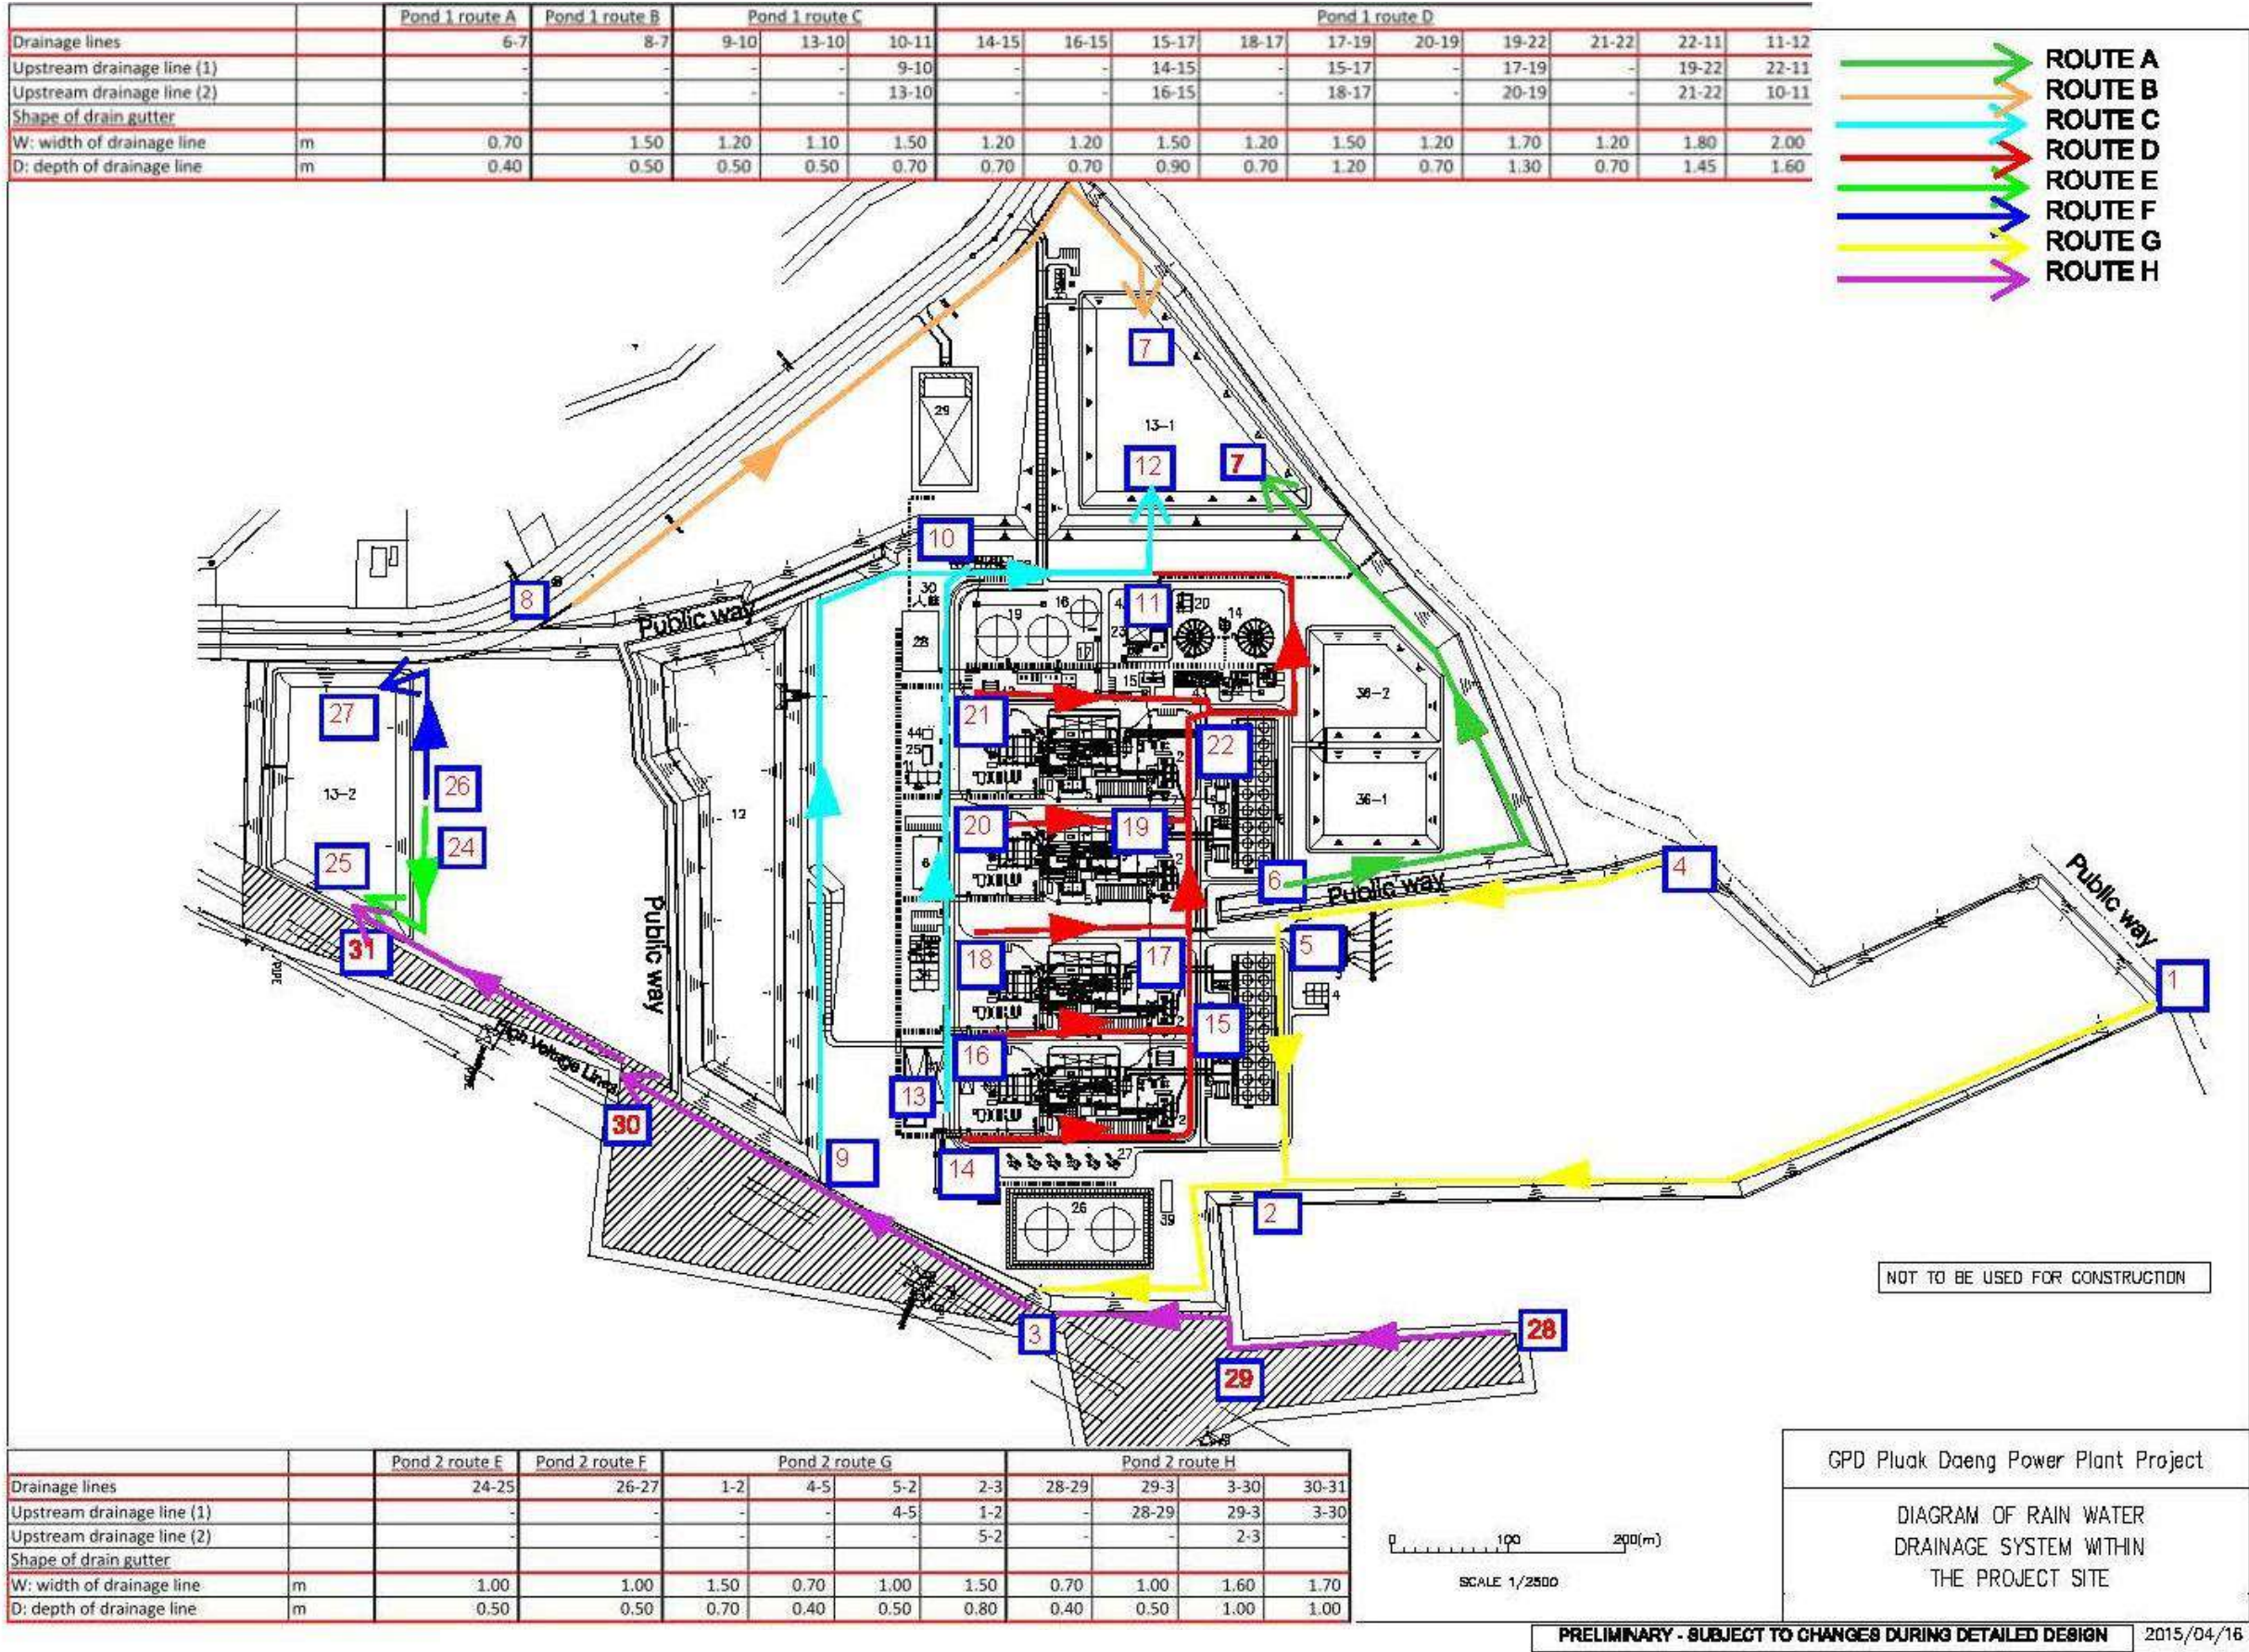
STORMWATER DRAINAGE SYSTEM IN THE PROJECT SITE
